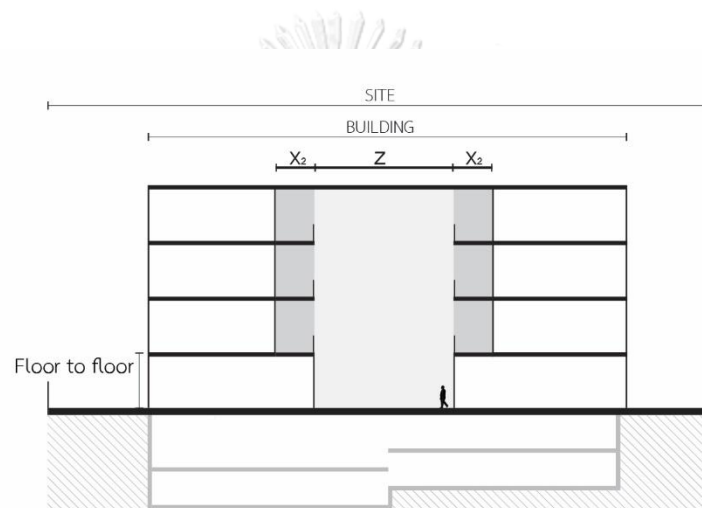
The section of the proposed community mall (floor to floor height 5 m.) with visible parts from the first floor highlighted in red.
